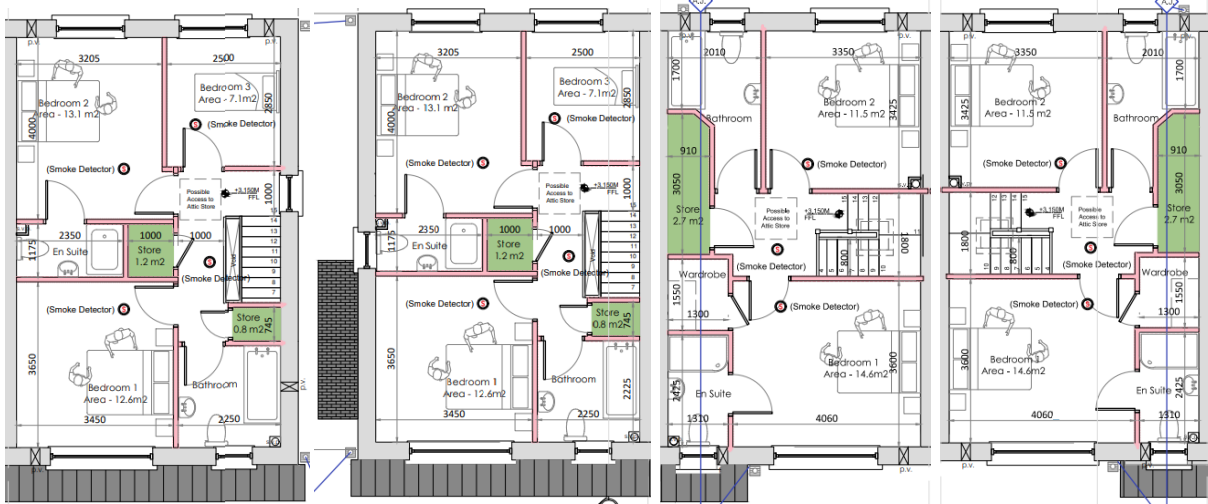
First floor plan of House Types E (left), ED (centre left), F (centre right) & FG (right)
